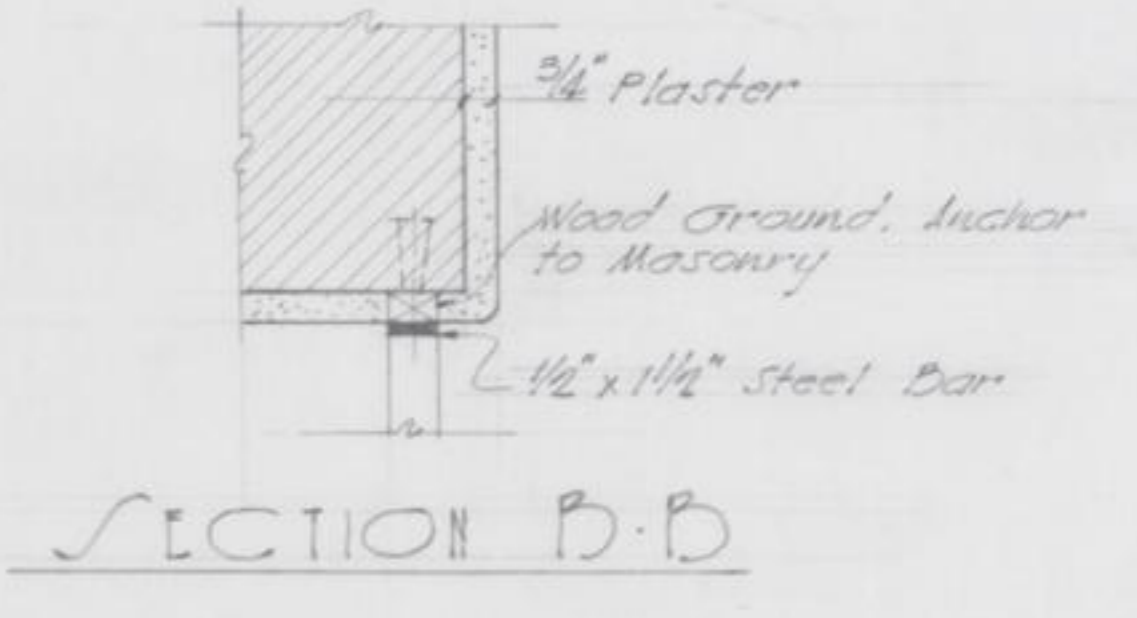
DETAIL OF GLASS BLOCK PANEL IN CONCRETE WALL SCALE 1/4\"/>
